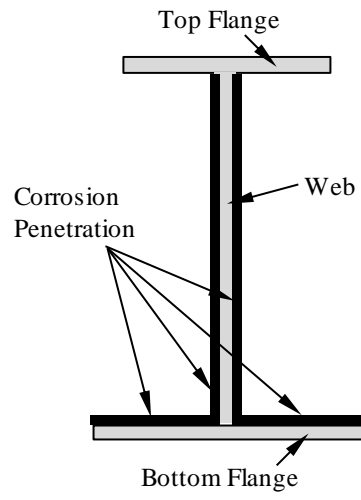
Corrosion penetration pattern in steel girders
